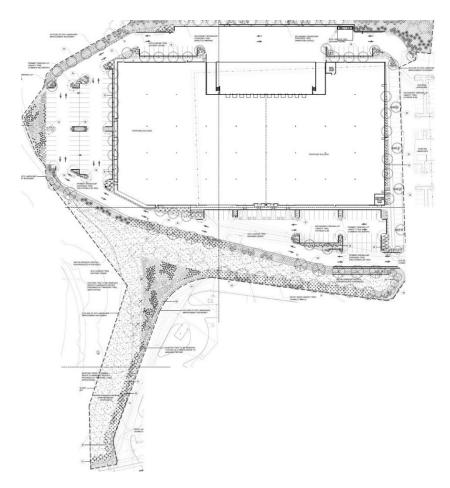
Preliminary Landscape Plan. The project's preliminary landscape plan shows the proposed building location as well as the number and locations of landscape trees to be planted on the site.
